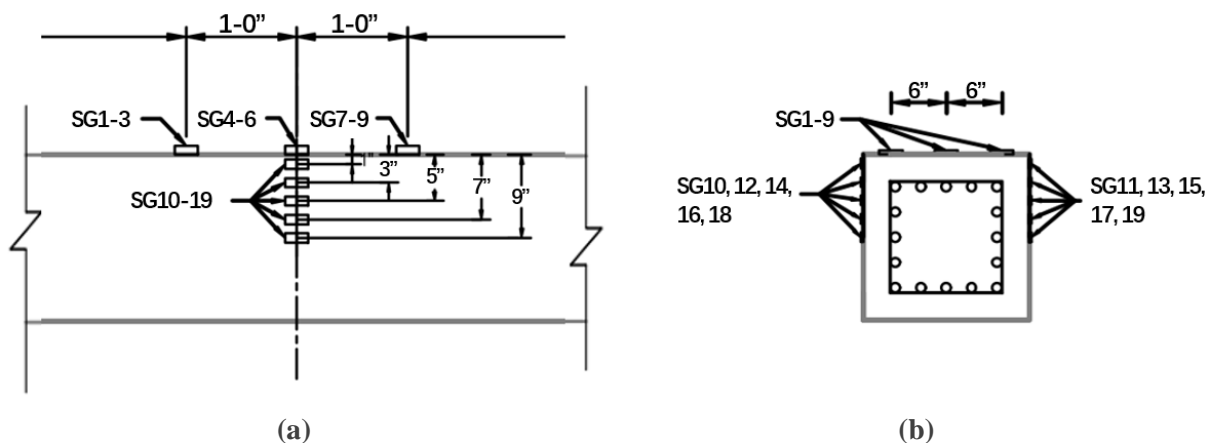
Strain gauge location with respect to midspan - 18-inch square UHPC pile specimen, (a) elevation and (b) cross-section
